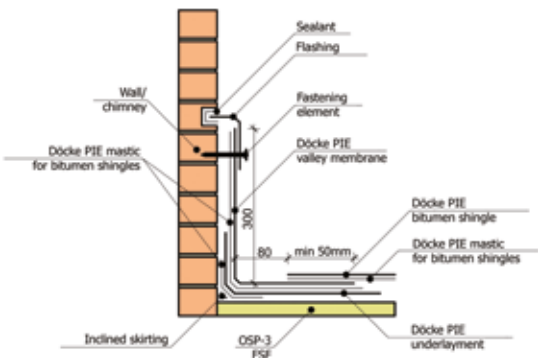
Flashing between the roofing and the chimney wider than 500 mm.
